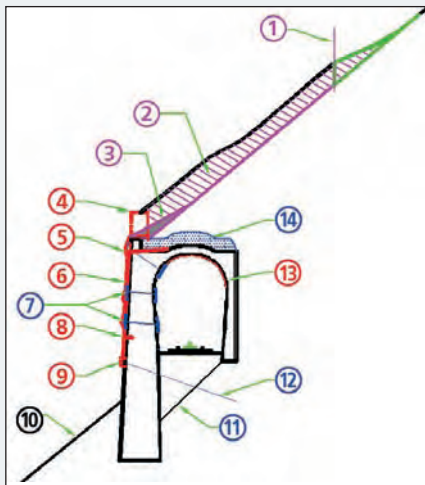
Cross-sectional diagram of tunnel head works: 1 Protective netting - 2 Scree to be cleared - 3 Protective talus - 4 Remains of original wall, to be demolished - 5 Weep holes - 6 Fibre-reinforced shotcrete - 7 Ties and cross pieces - 8 Weep holes - 9 Bottom beam - 10 Talus - 11 Limit of rock substrate - 12 Supporting anchor - 13 Fibre-reinforced shotcrete - 14 Injected area.
